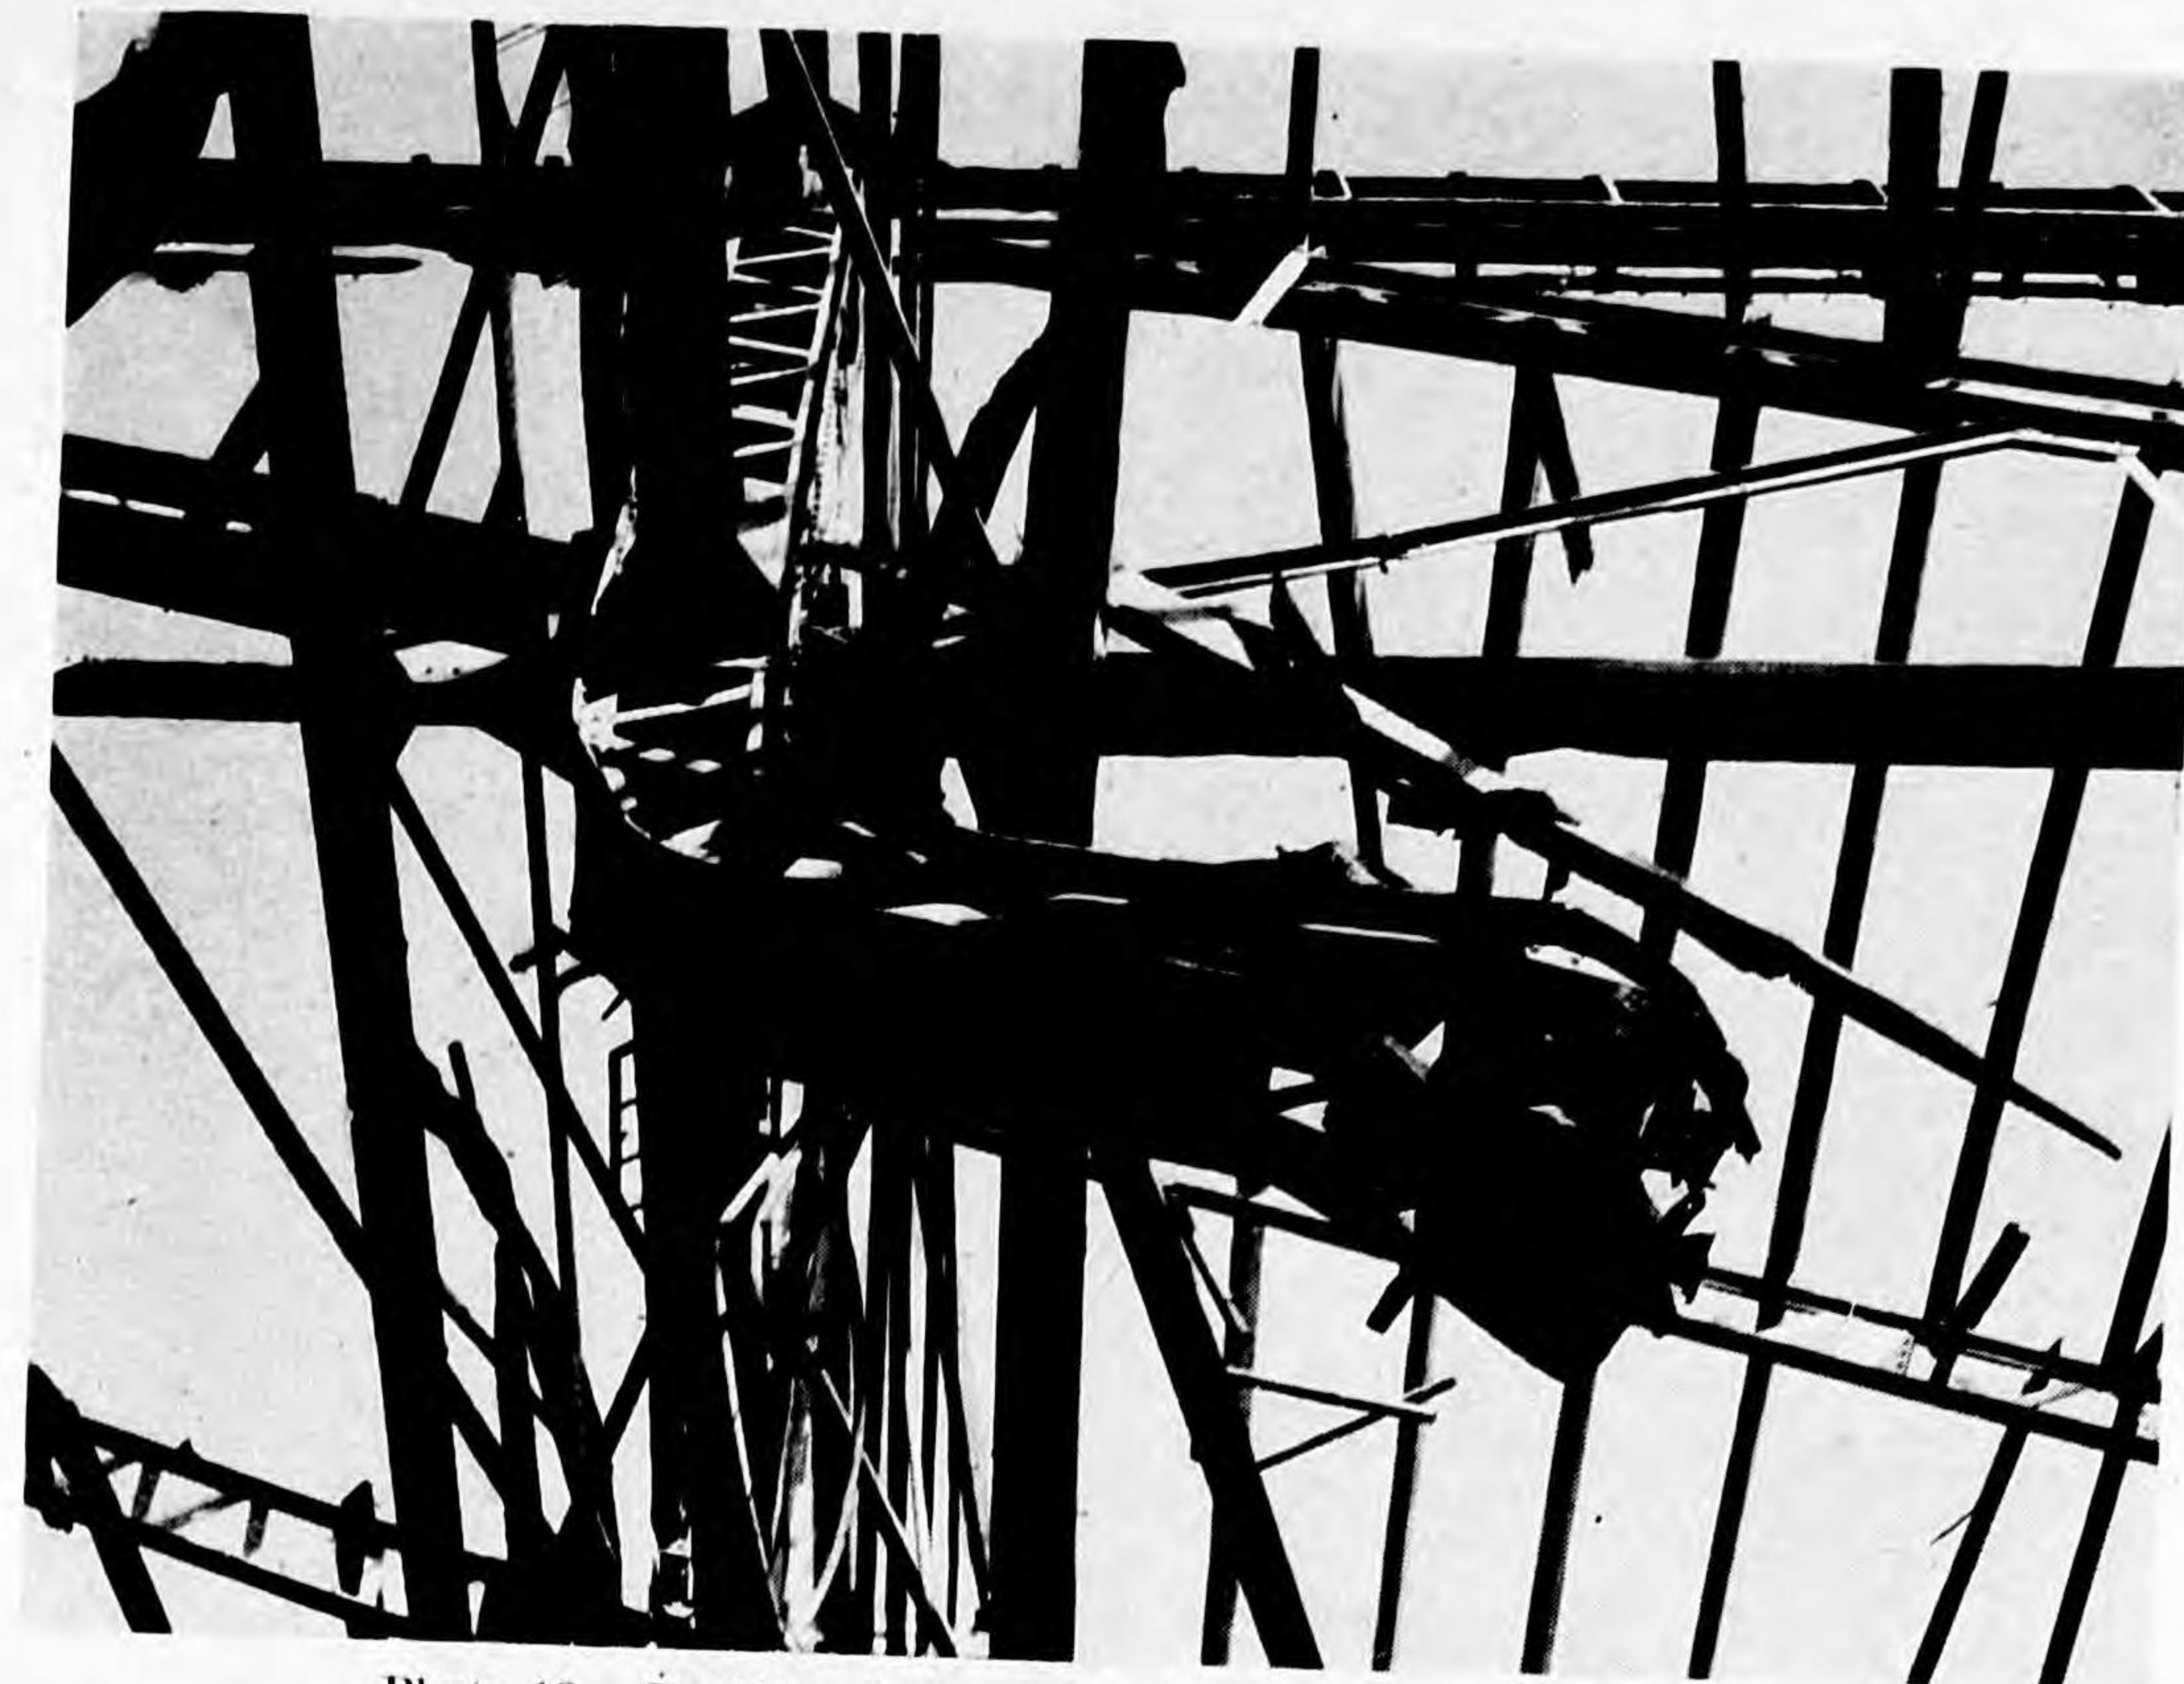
Building 3, Bomb 17; detail of destroyed column.
